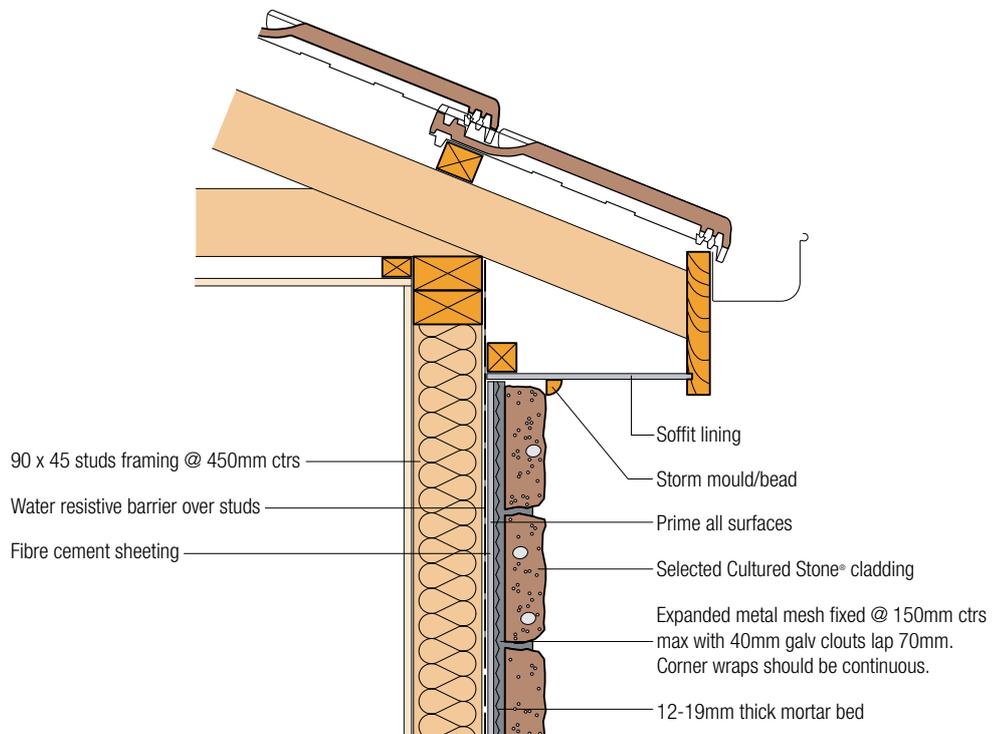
Typical Eave - Section (Dwg # CS-09.04)
